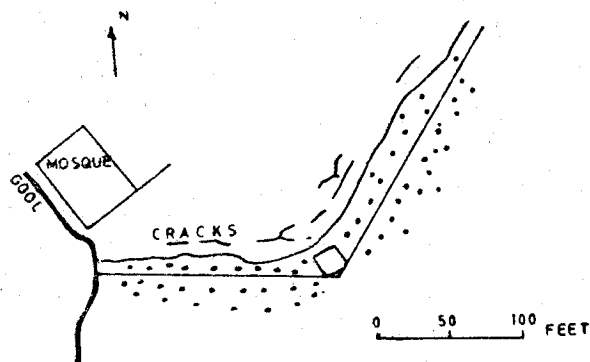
Failure of Rubble Stone Retaining Wall at Dragam. The Back Fill was fully Saturated due to Seepage from the 'Gool'
